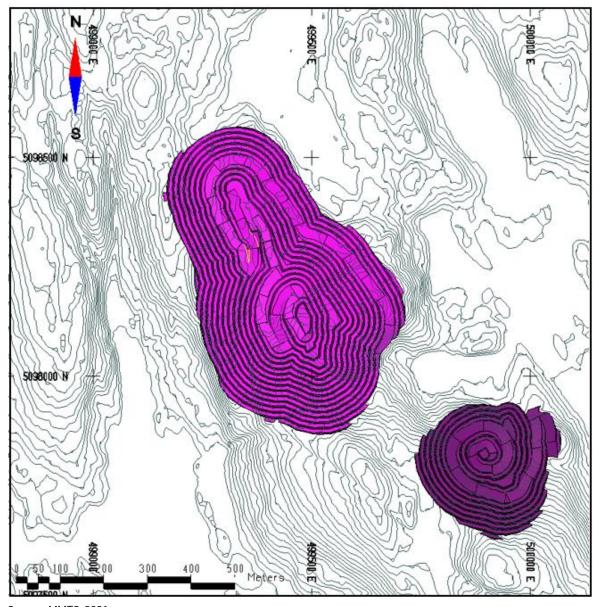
Plan View of Starter Pit EV-N1 with Total Pit Outline
